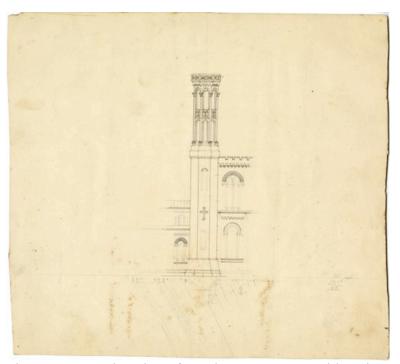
Elevation of Southwest Tower, Smithsonian Institution, Washington, D.C. James Renwick, Jr., c. 1846.
